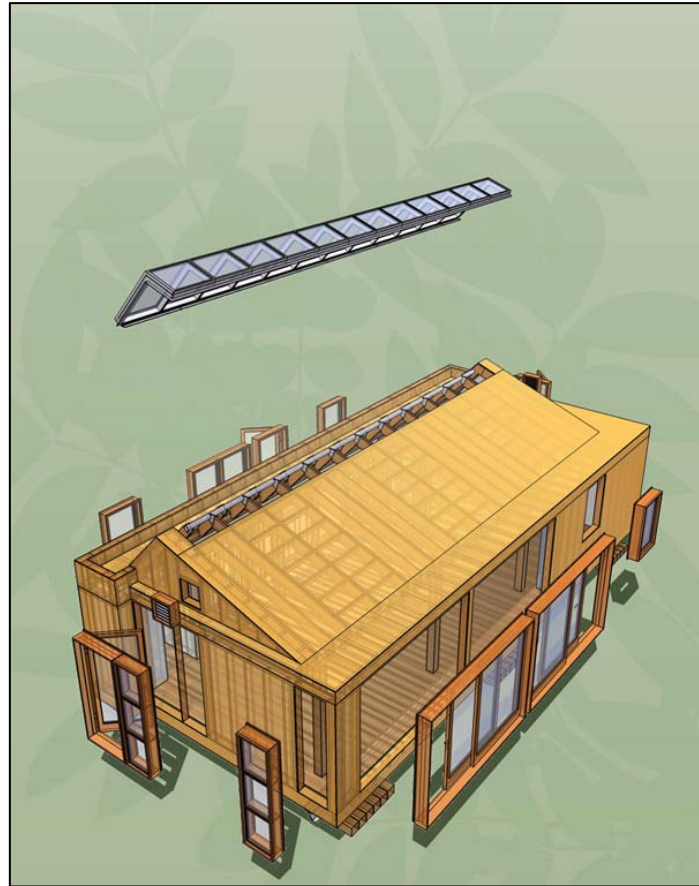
Door & Window Sequence. [LEAFHouse Team]
